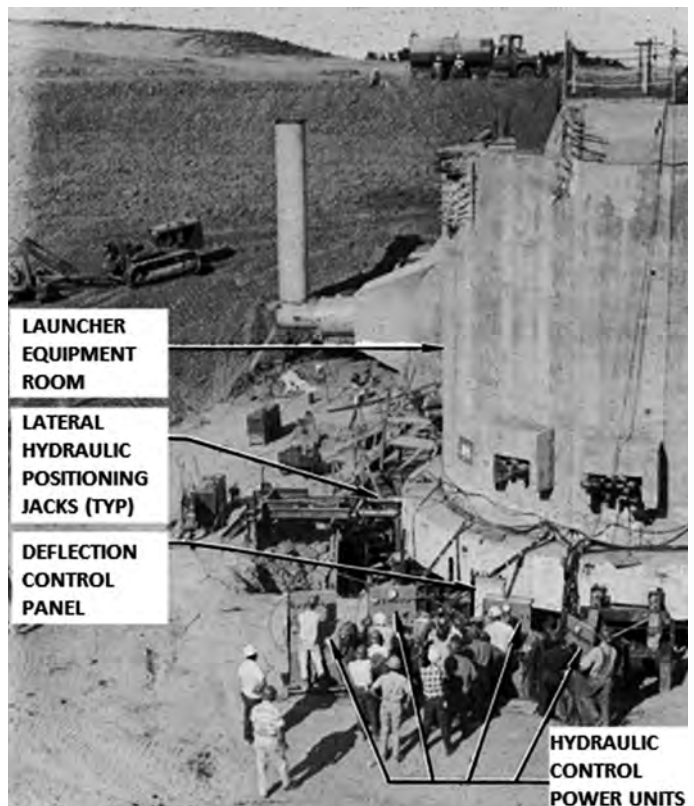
During construction at Grand Forks AFB two of the launcher equipment rooms settled beyond specifications. The structures were excavated and repositioned using massive hydraulic jacks. A similar technique was used to repair LF-28. (Courtesy of Boeing Company.)
